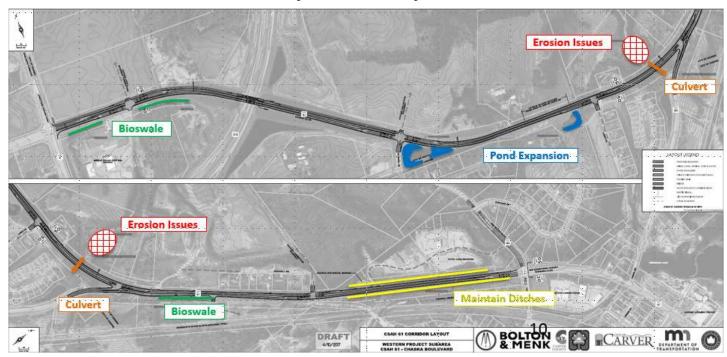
Western Project Area preliminary stormwater management exhibit. BMPs identified above are conceptual only. Sizes and locations of BMPs shall be further refined under future preliminary road way improvement and construction planning phases.
